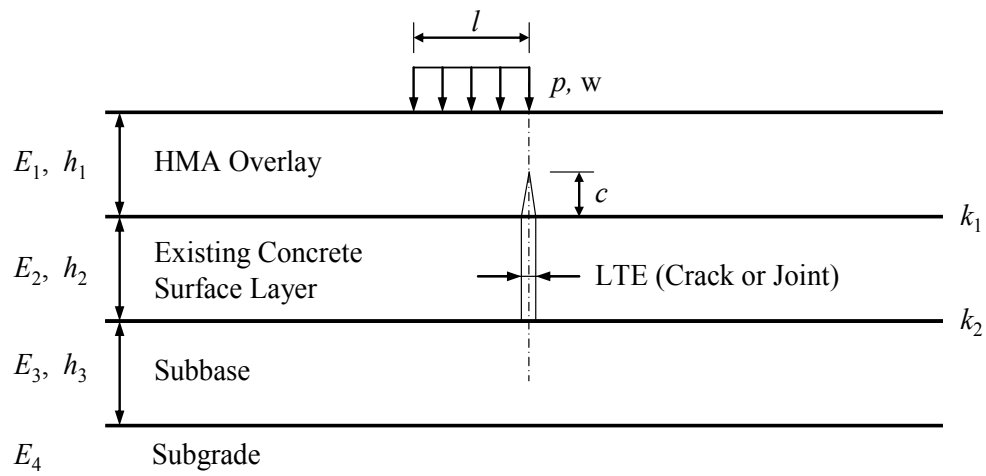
Diagram of HMA overlay on jointed concrete pavement-shearing.
